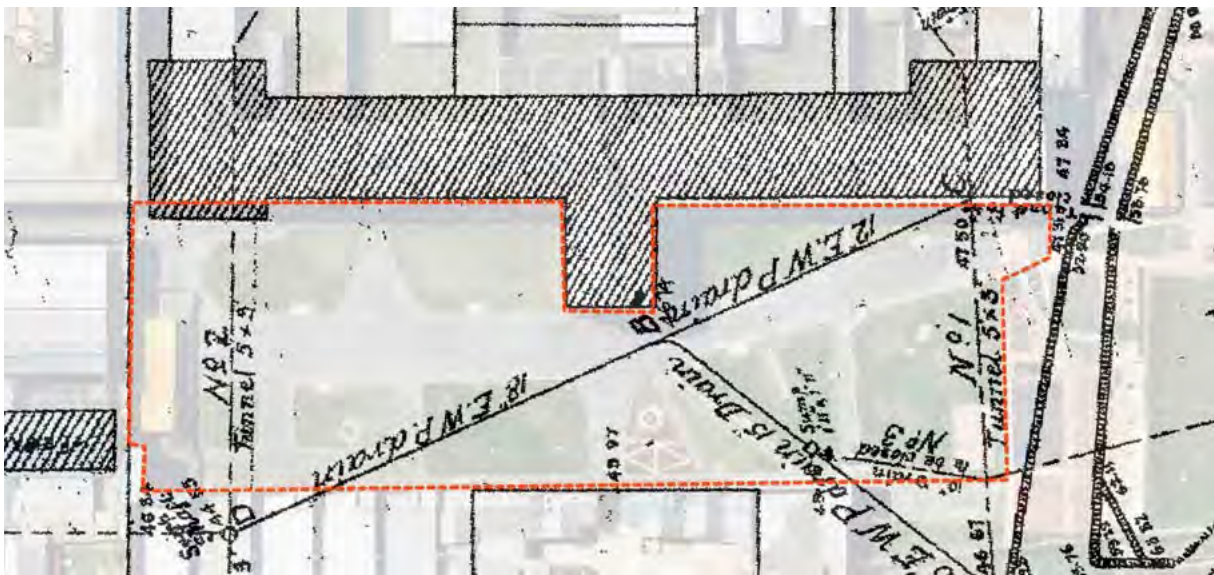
The location of two new drains is shown in this 1897 plan, however, the locations of these drains are not shown in any subsequent plans, suggesting that they may have been proposed and not constructed. The existing convict era tunnel drains are still visible in this plan.
